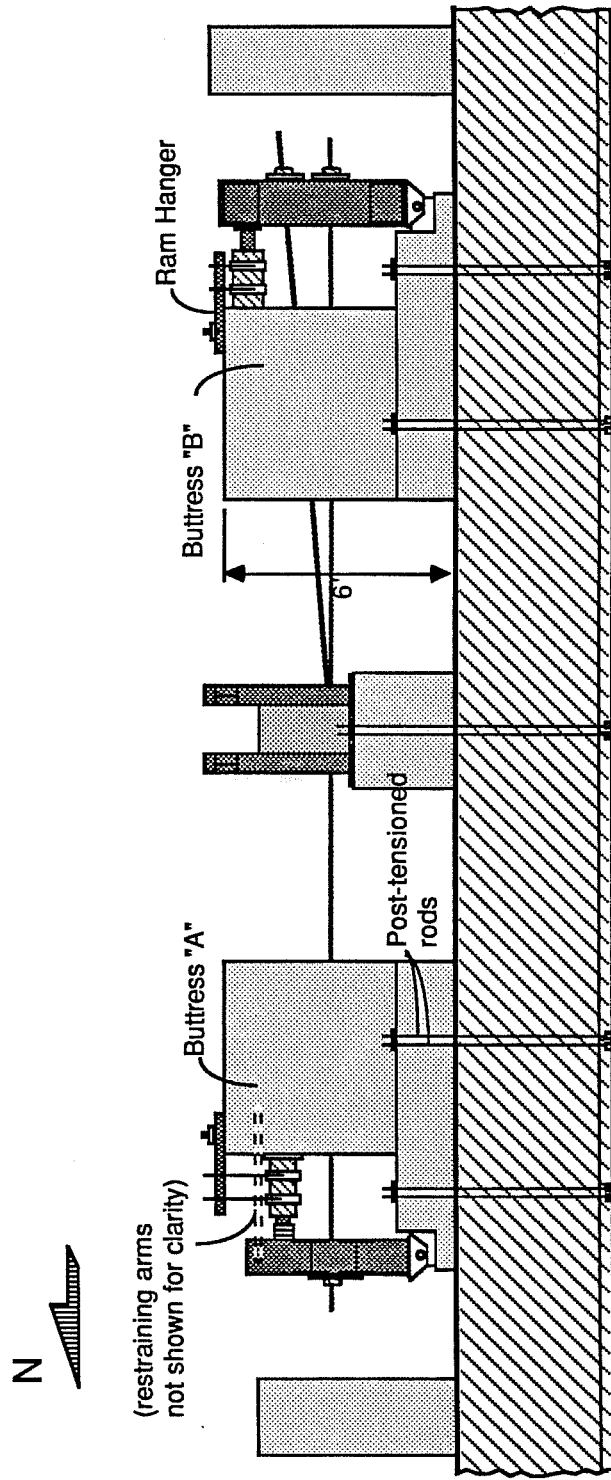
Test Setup, Elevation (From Ref. 1)
